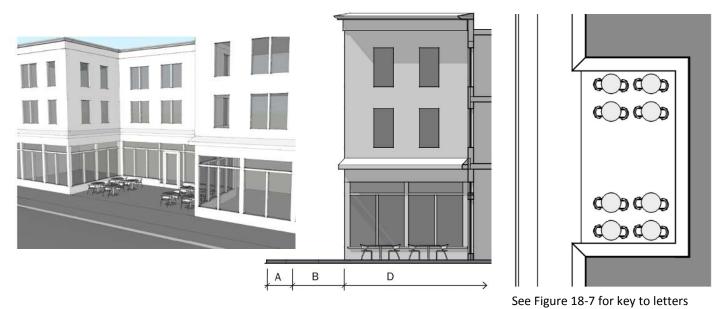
Illustrative View, Section View, and Plan View of Forecourt Frontage Type
